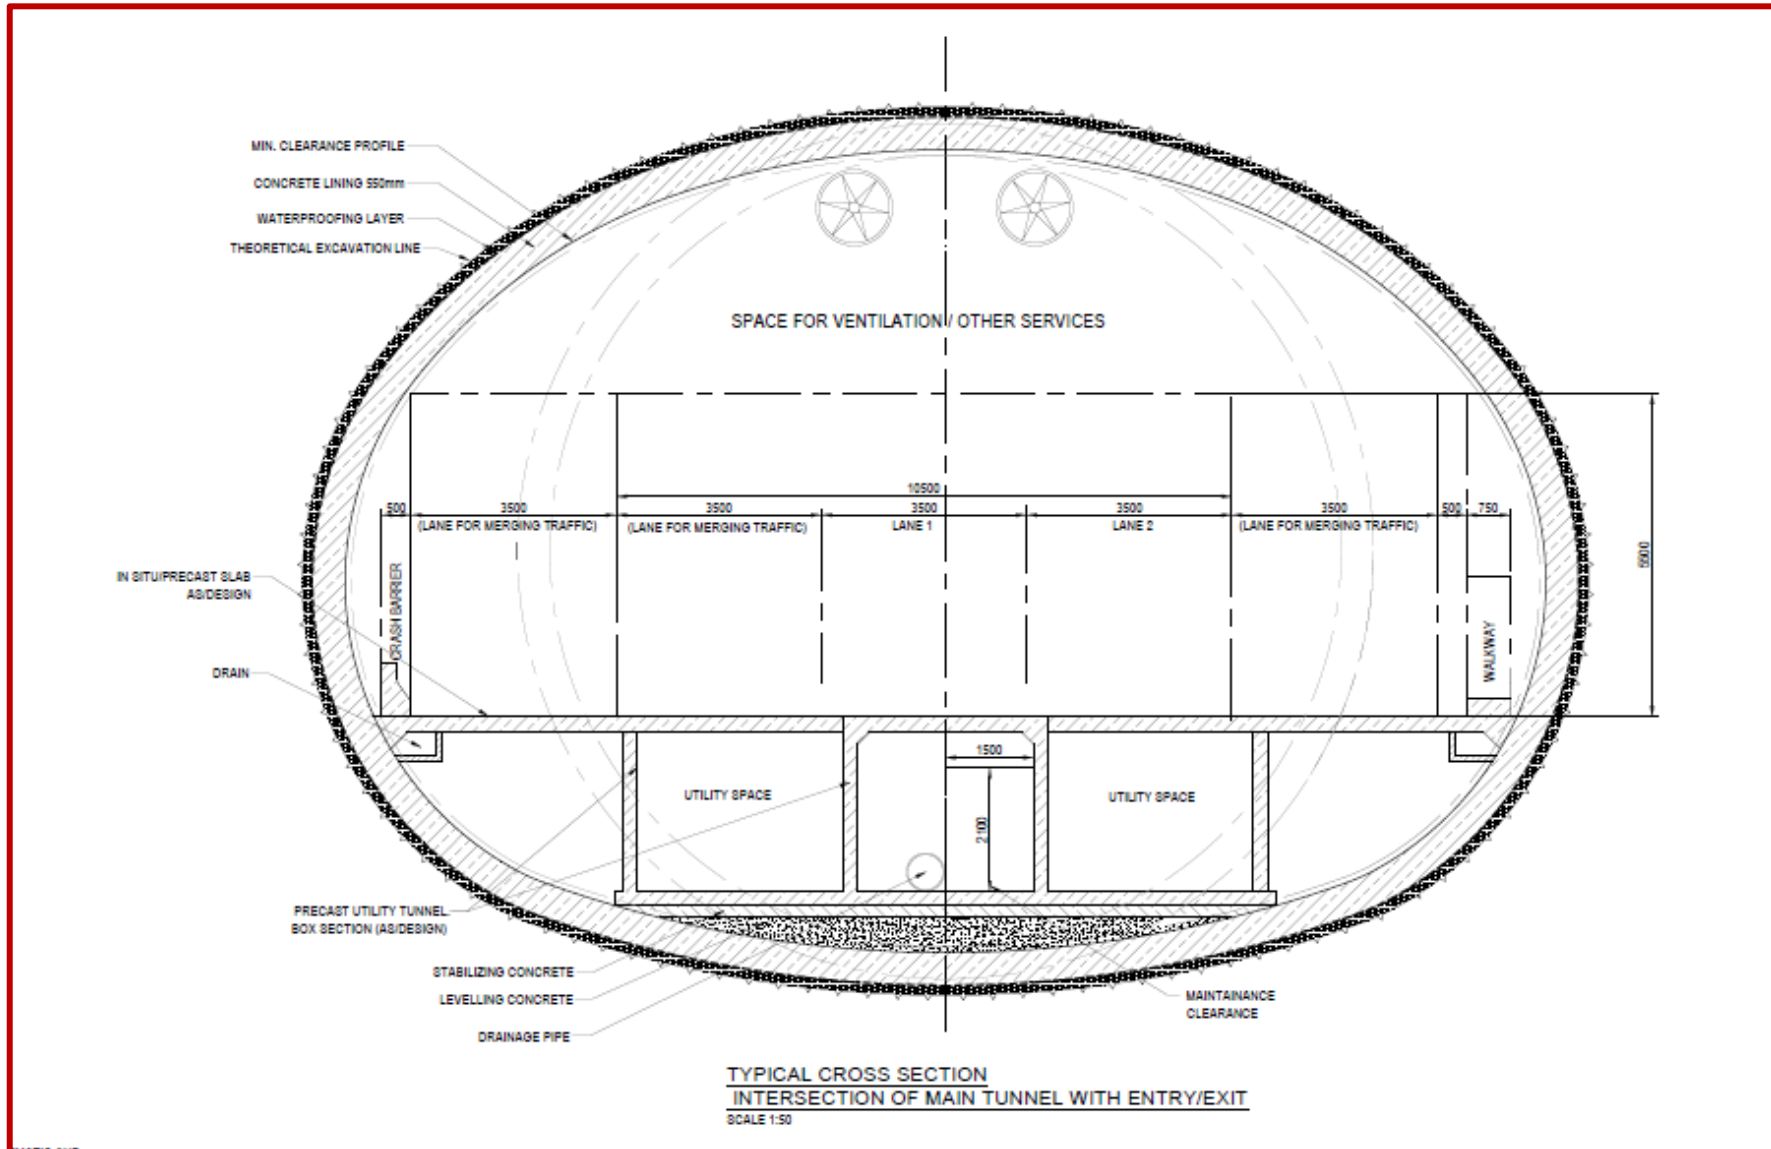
Typical Cross Section for merger section of Entry/ Exit Ramps & Main Tunnel
